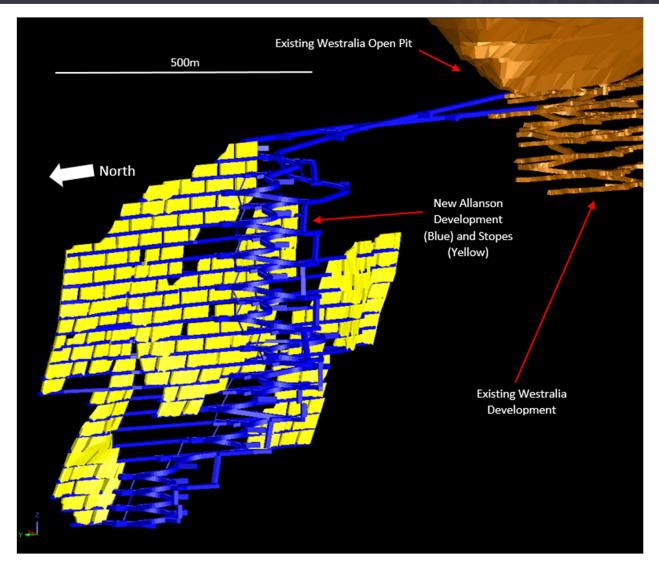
Isometric view of Allanson underground mine design for initial Ore Reserve. New underground development is in blue and new stoping blocks are in yellow. Previous mine development is shown in brown.
